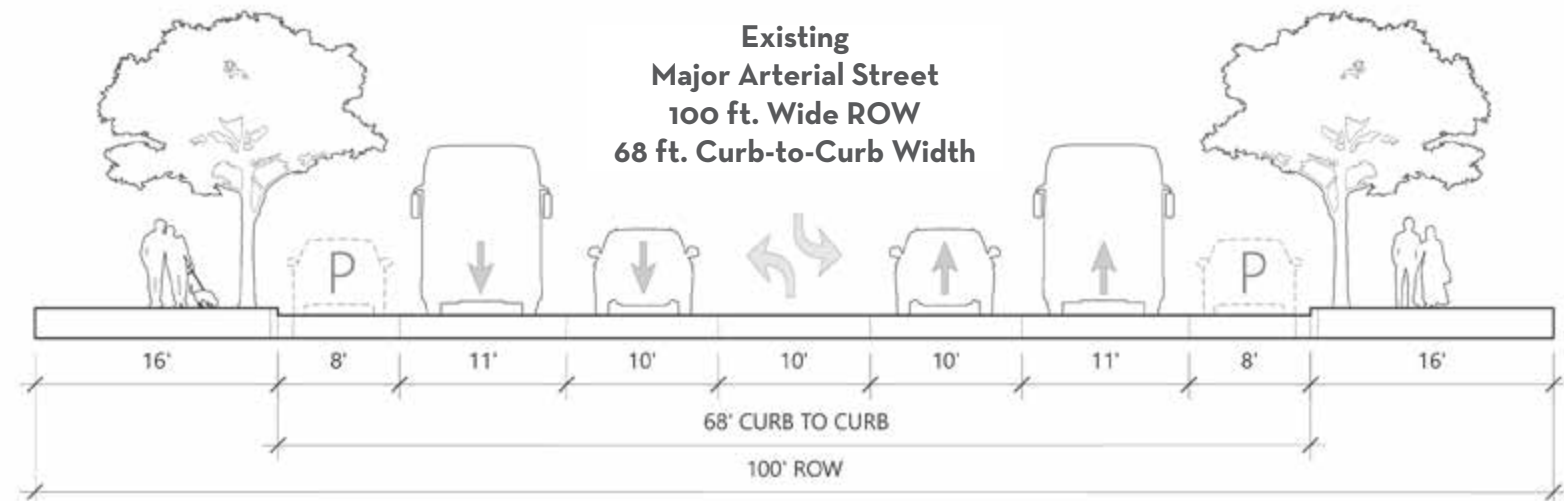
Existing: Typical Major Arterial Street with a 100 ft. wide ROW and 68 ft. wide curb-to-curb. See Chapter 8D-1 Roadway Reconfigurations for minimum travel lane widths.
